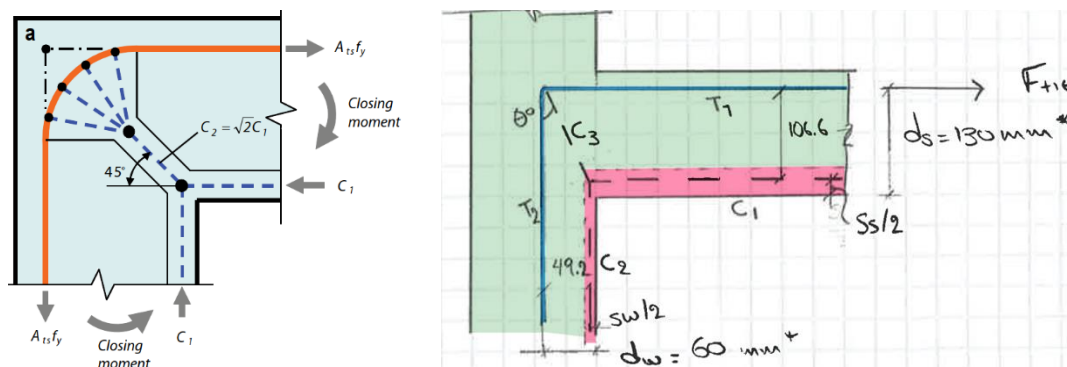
Strut-and-tie model of forces concept (left) [10], flank wall strut-and-tie analysis model of Barton House (right)
